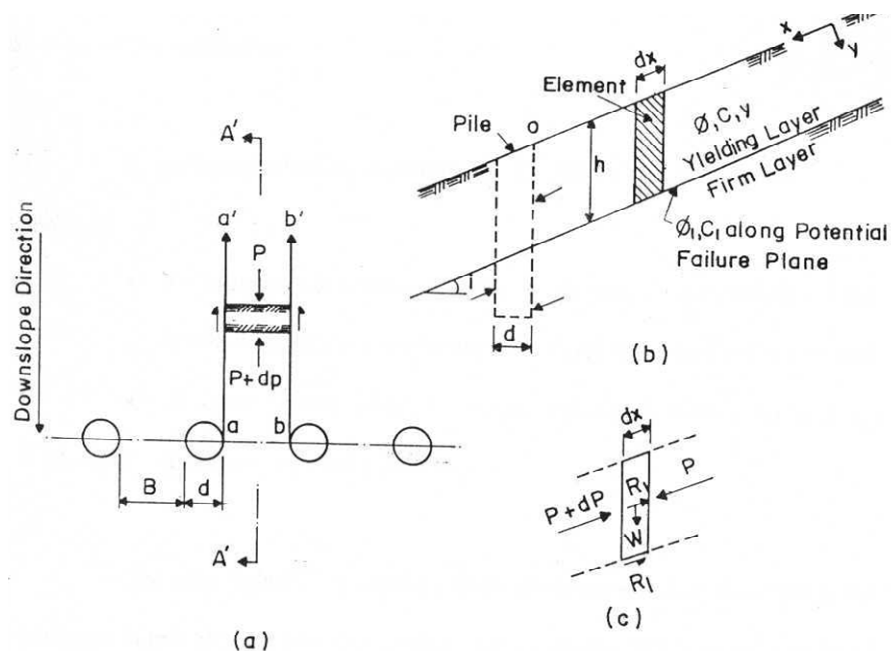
Views of piles on slope: a) Plan b) Cross-section c) Element (Wang and Yen, 1974).
